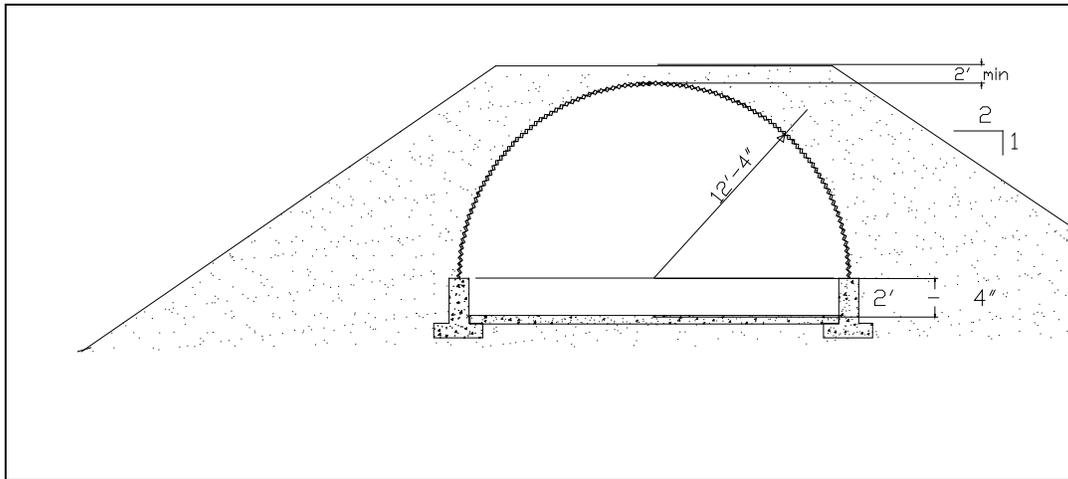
Section in a typical ammunition and explosive storage magazine.
